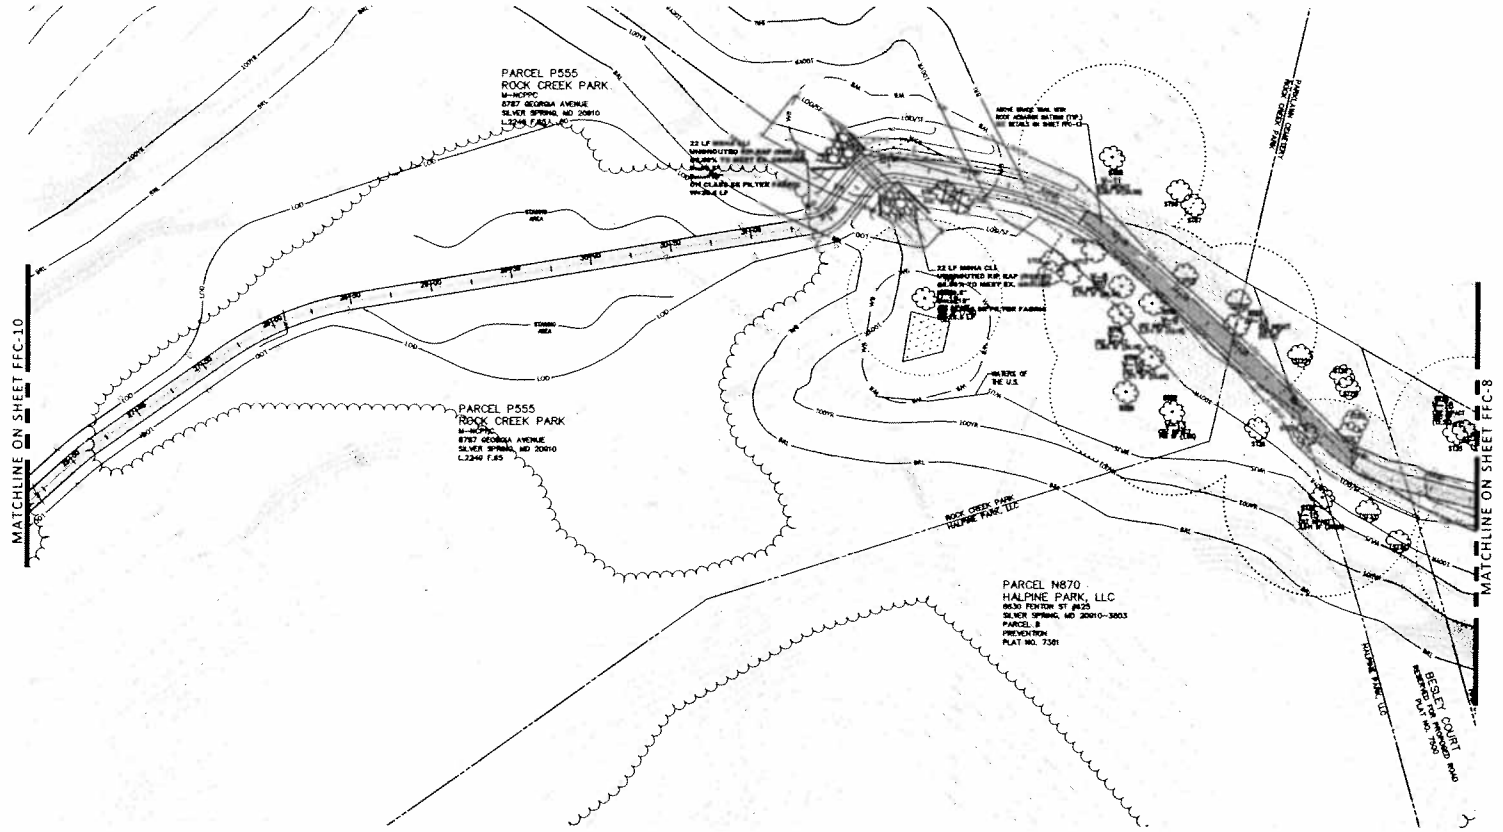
DETAILED FINAL FOREST CONSERVATION PLAN AMENDMENT 82011009A
